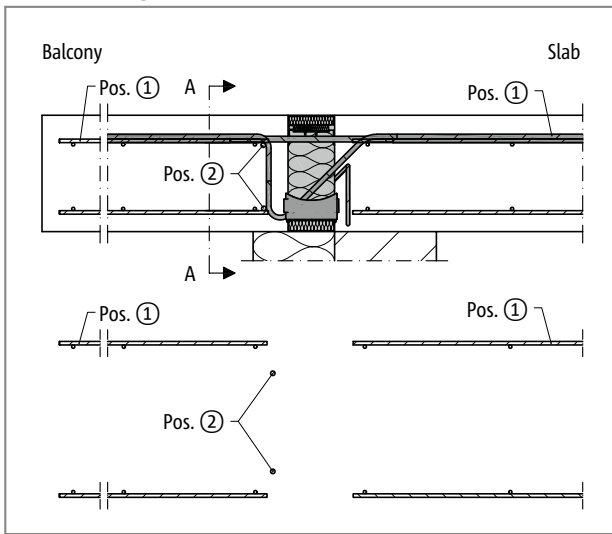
Schöck Isokorb® T type K-E, K-T: On site reinforcement; inner slab edge with wall support
